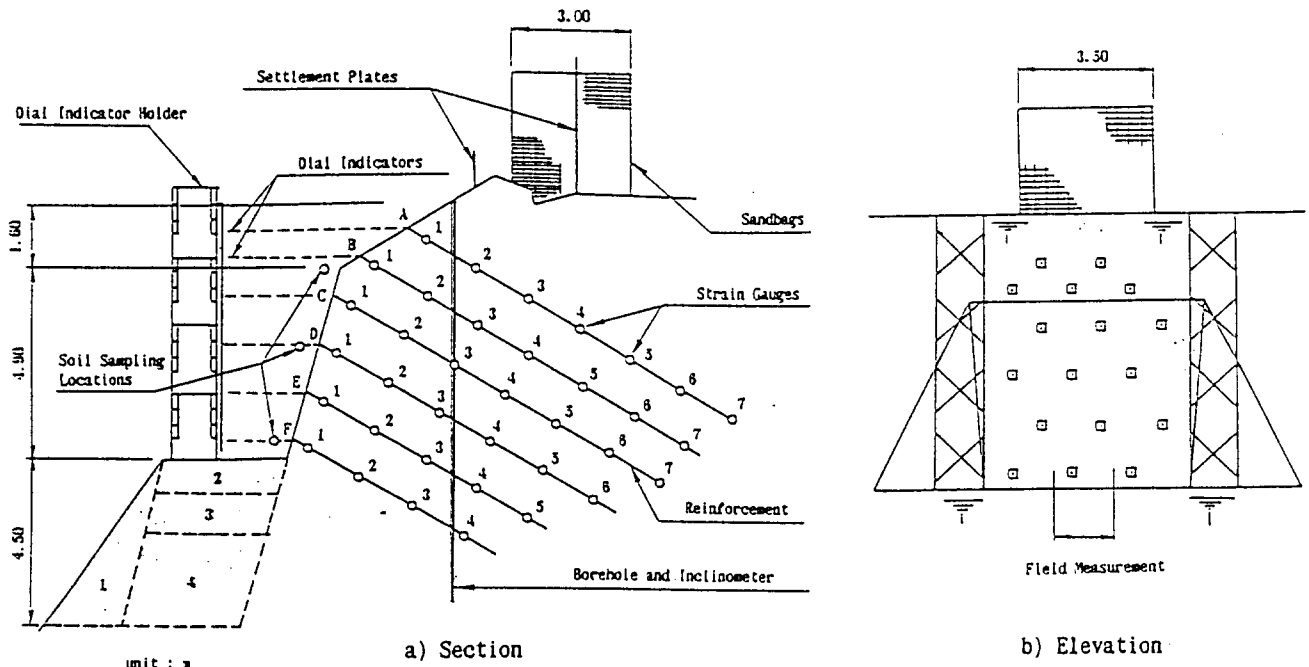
Section and elevation of reinforced slope for field test at Kashiwara site
